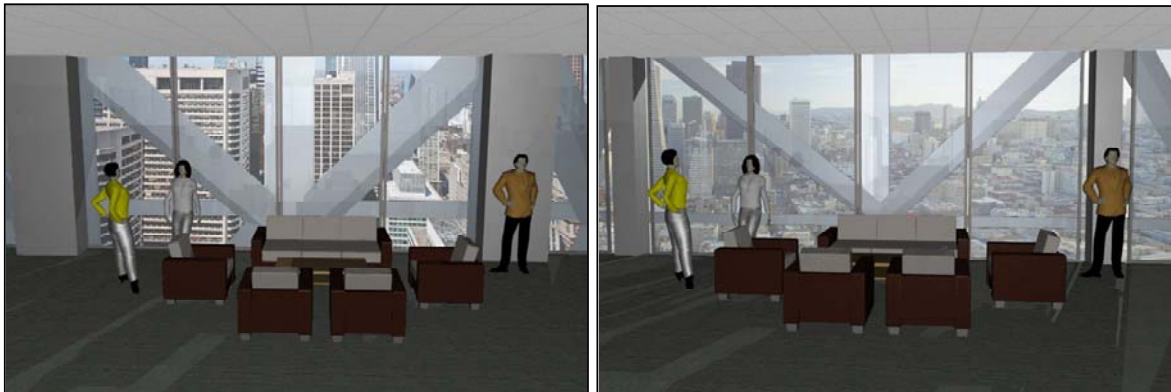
(a) A view at a lower floor of a multi-storey double-layer space structure using an exposed structure façade; (b) A view at an upper floor of the building using the same façade
